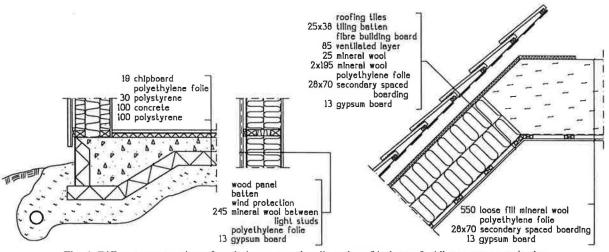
Different constructions: foundation, external walls and roof in house 3. All measurements in the figure are in mm.
